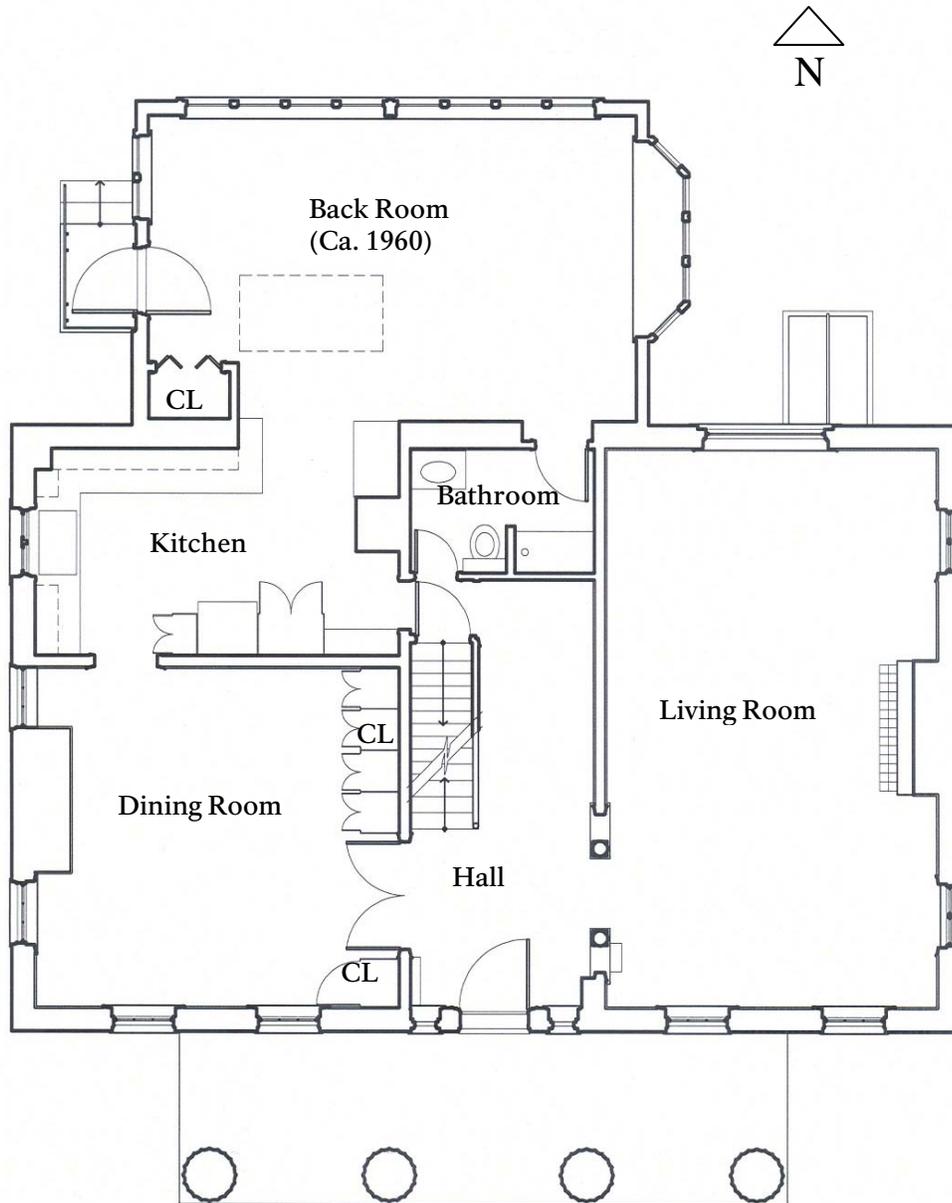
First floor plan of the Hunt House, December 2006. Room names added by Barbara Yocum. Not to scale.
